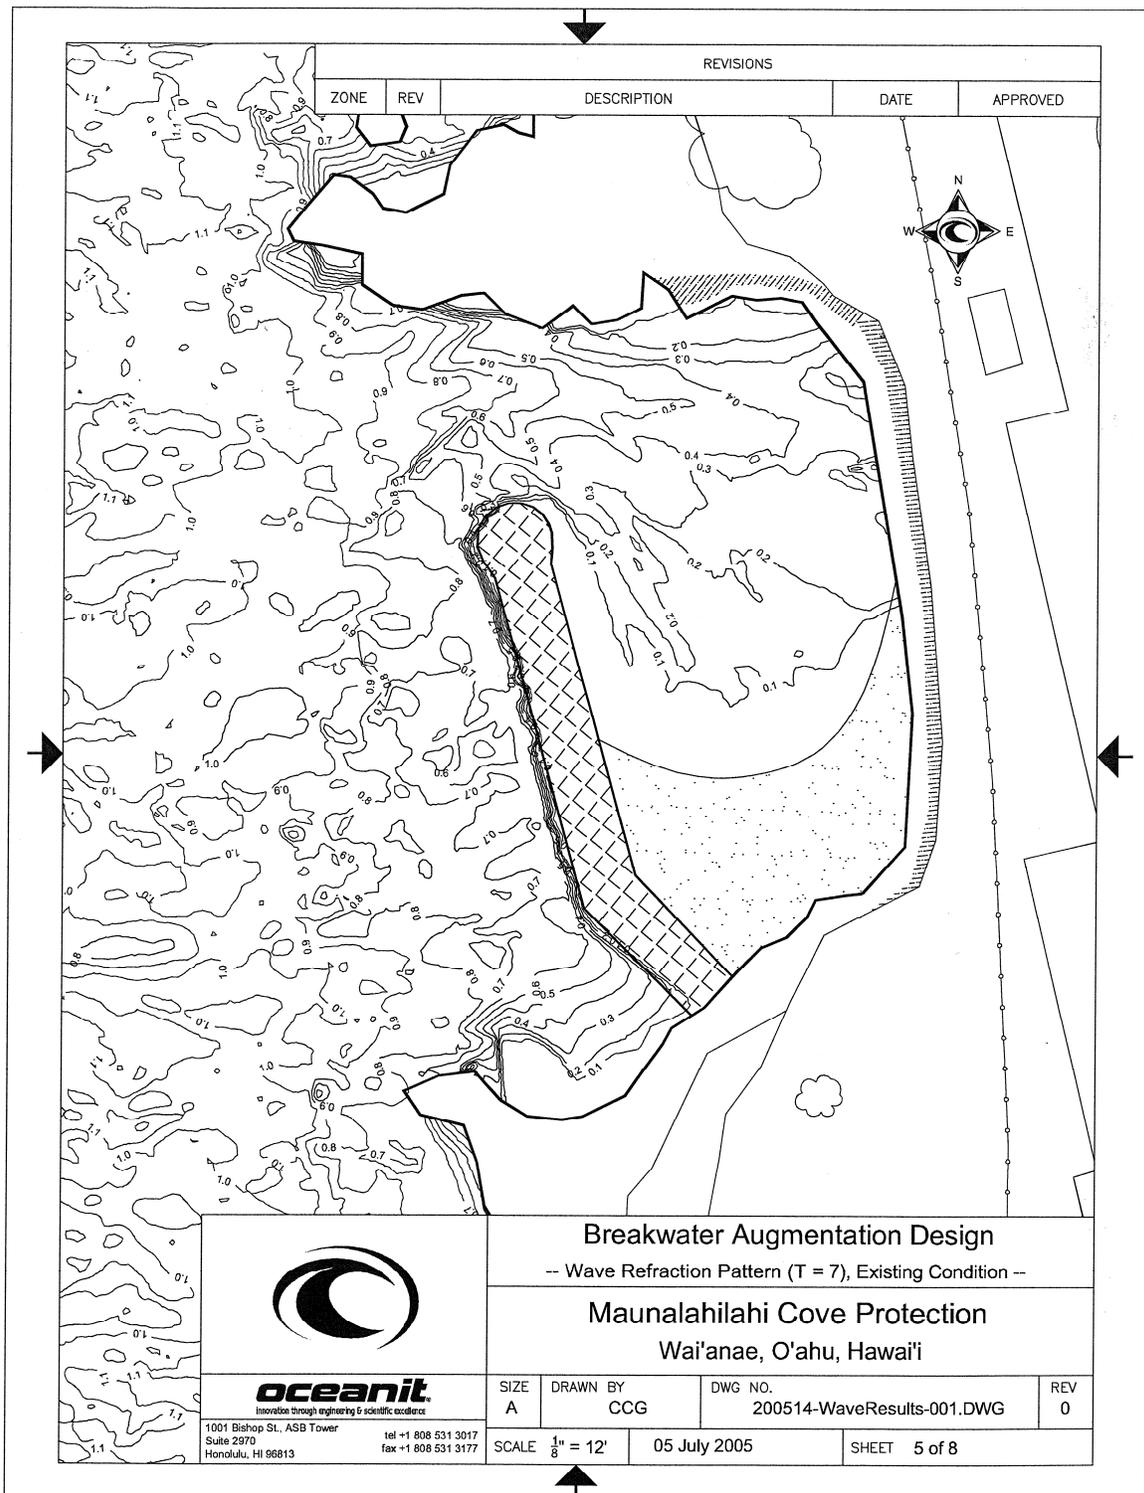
Unit Height Wave Transformation Contours around Existing Breakwater
